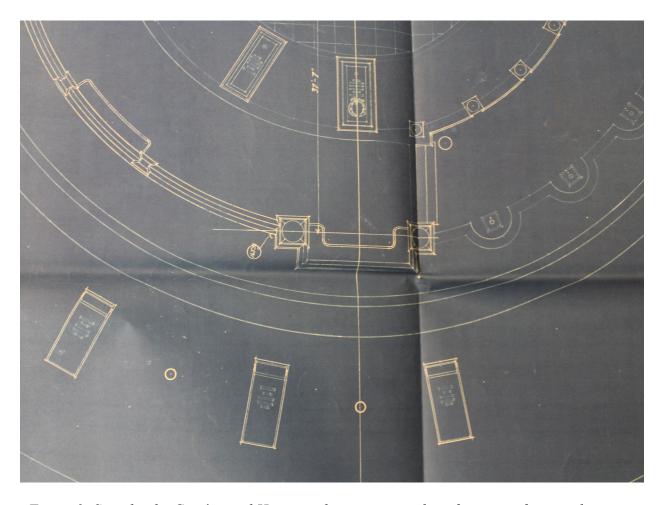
Site plan by Carrère and Hastings showing original configuration for outside graves
